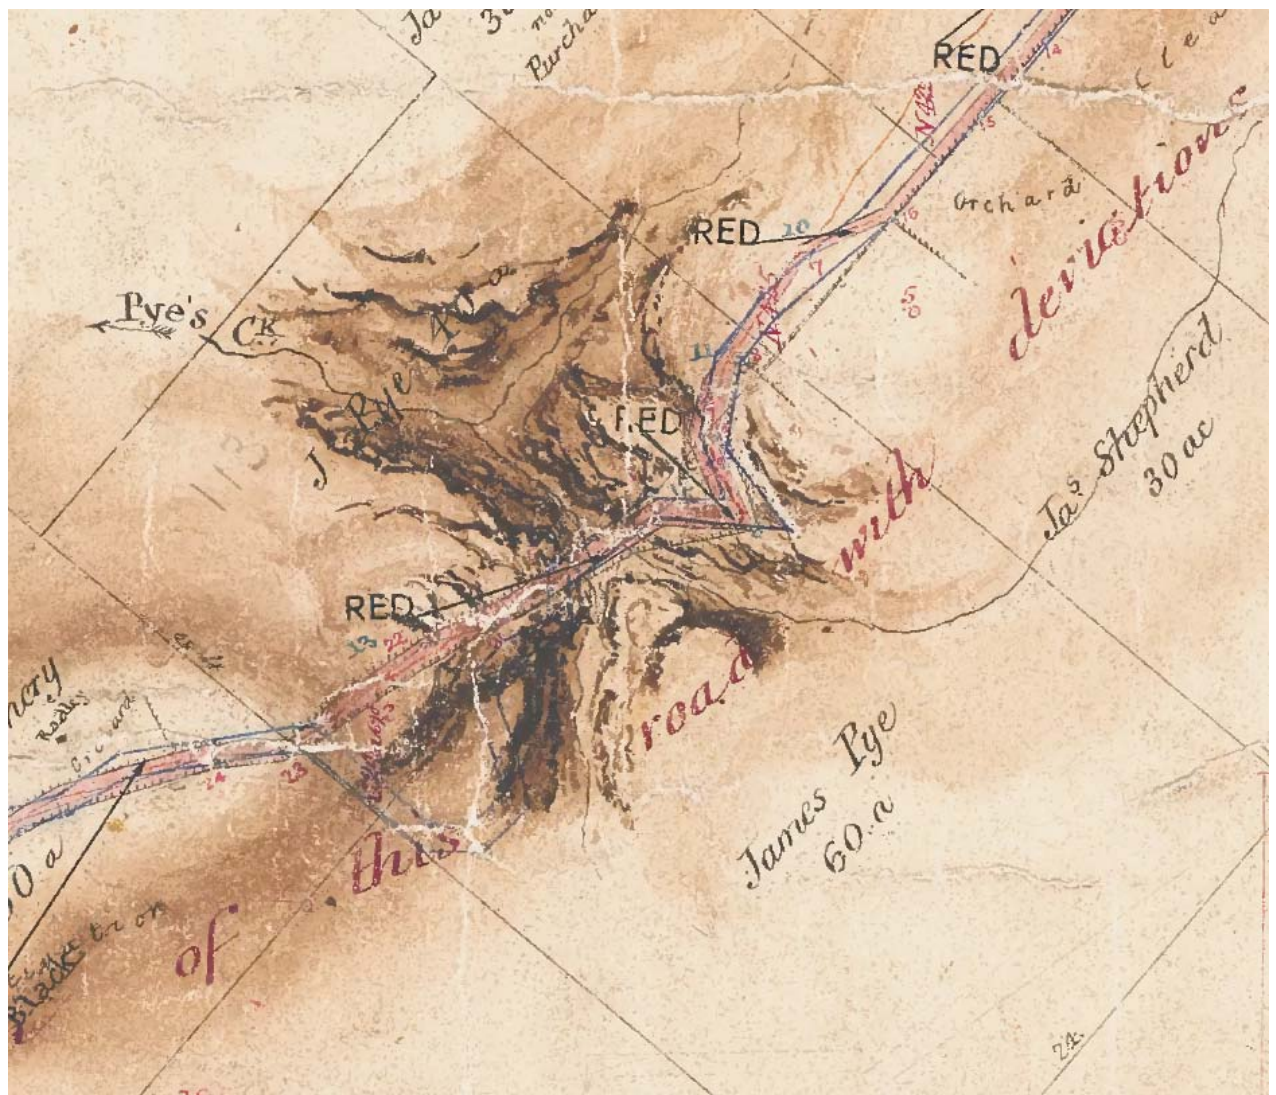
E J H Knapp's survey of 31 August 1869 of a revised alignment of the road to the north that had become the main road showed no detail of the original Great North Road to the south. Source: R.882.1603, Crown Plan
